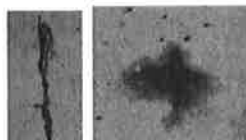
Breakage of capsules due to cracking in a zone containing capsules filled with PU 1 (left) and a zone containing capsules filled with WRA 1 (right).
